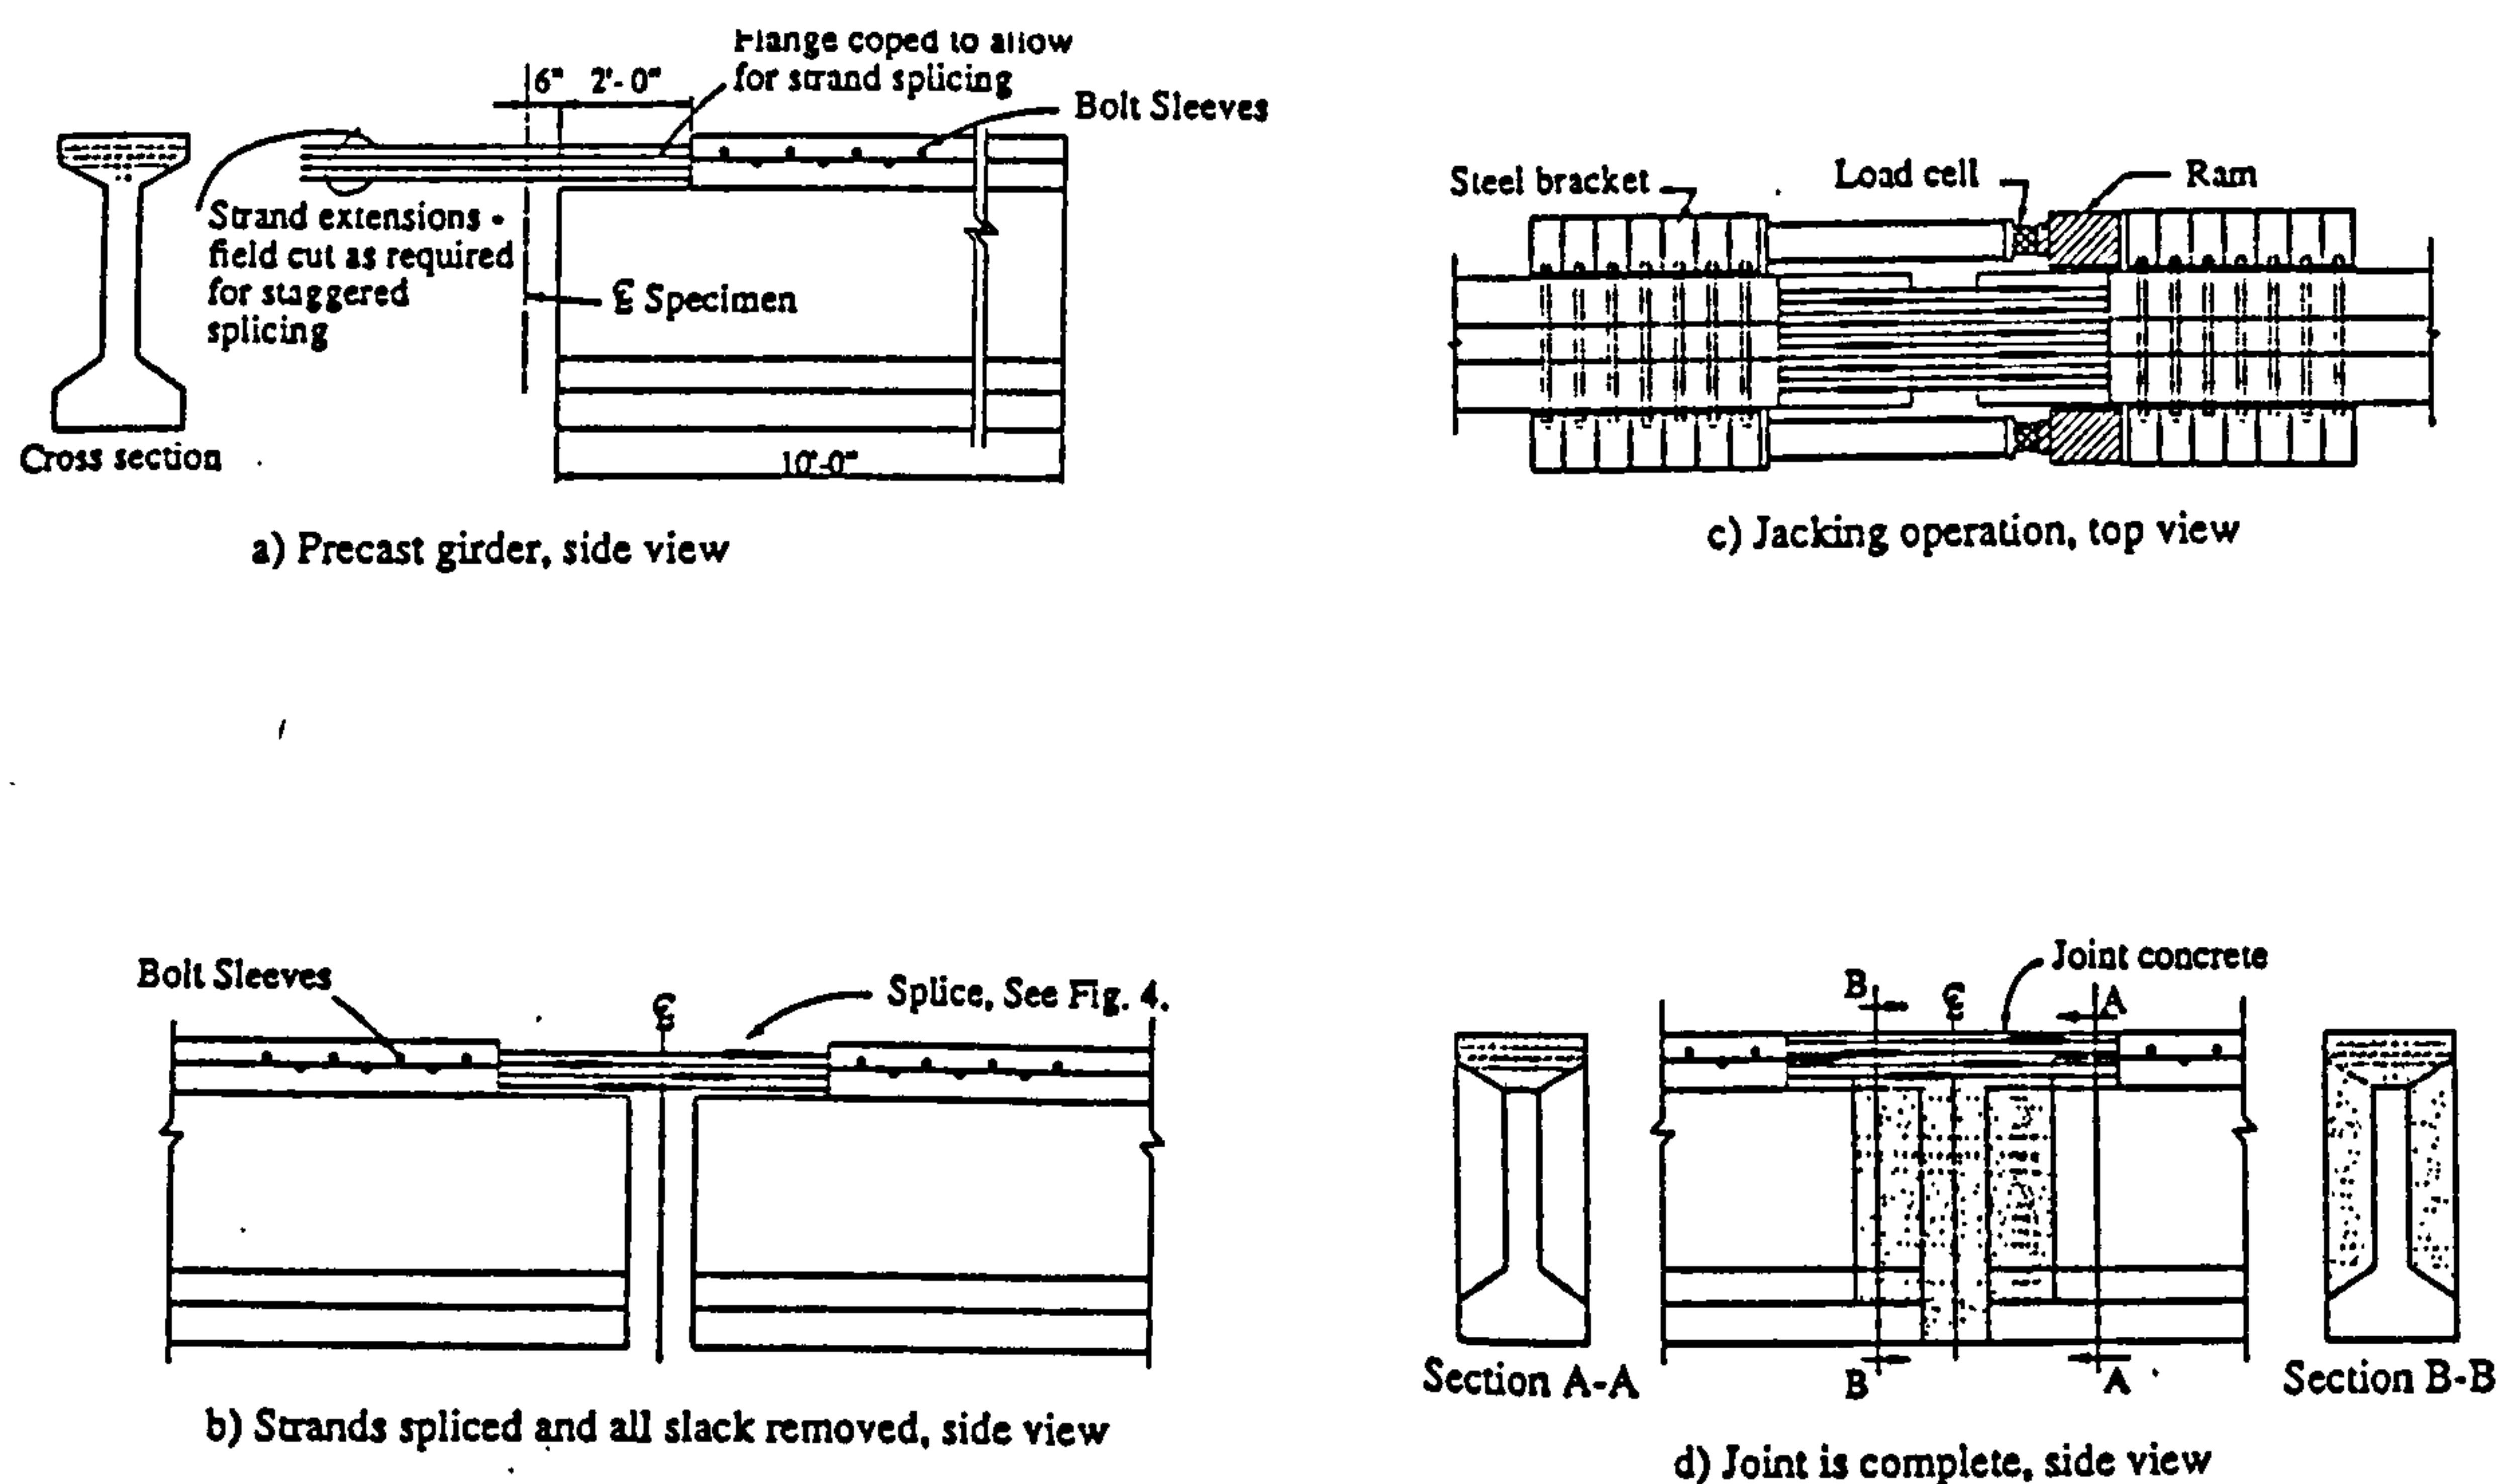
Connection of precast beams using splicing of the pretensioned strands technique (Tadros *et al* 1993)
